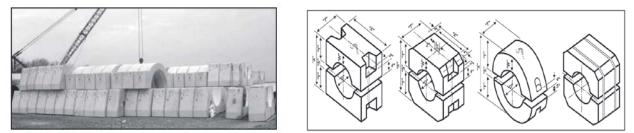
Examples of Concrete Collars Used to Ballast HDPE Pipes
